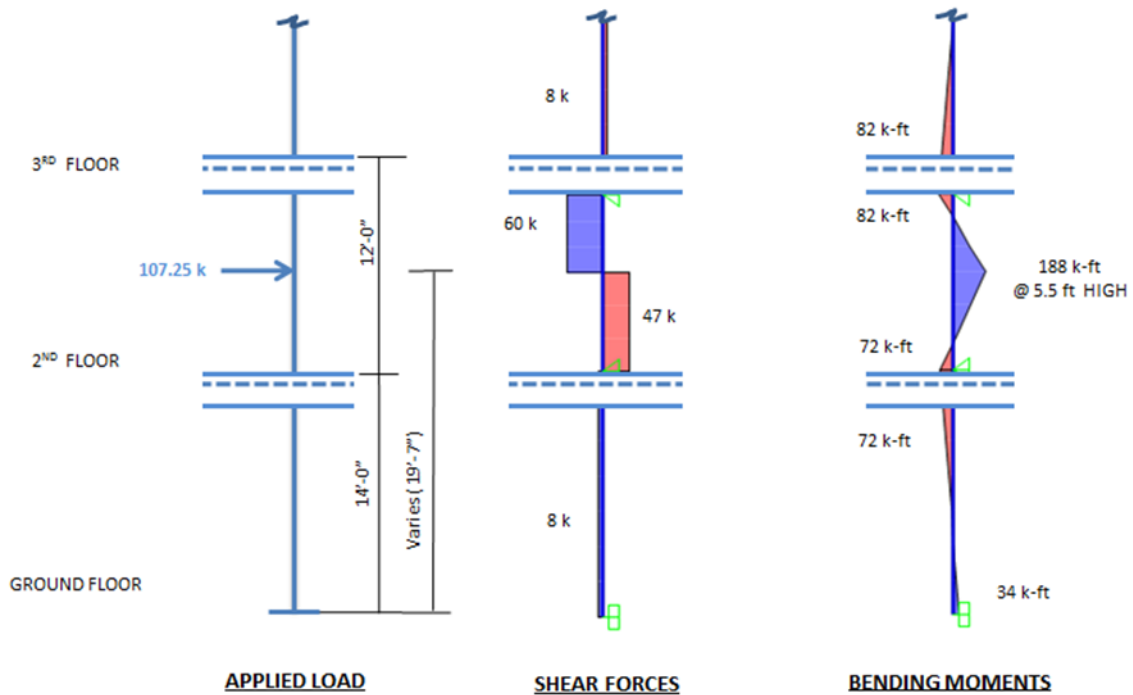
Impact load applied at " $d + h_c$ " away from the end of column on the 2nd floor
